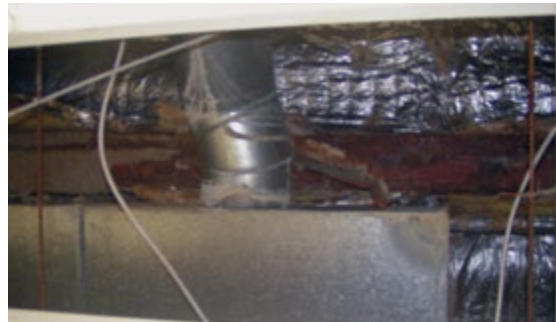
Missing fireproofing and rust on a structural steel beam above the Dollarama store
